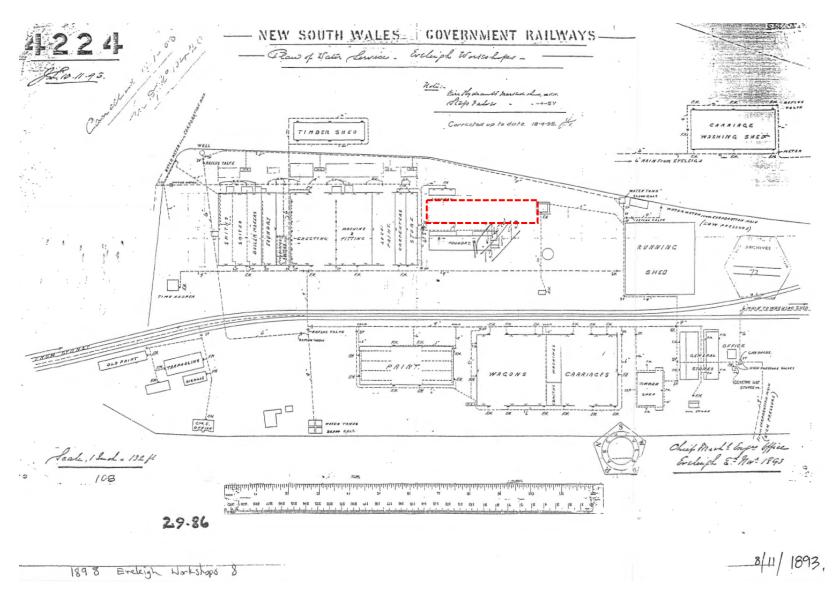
1893 Site Plan of the Eveleigh Railway Workshops prior to the construction of the LES. Location of the subject site is marked in red. (Source: State Rail Authority Archives, NSW State Archives, 4224-72)
